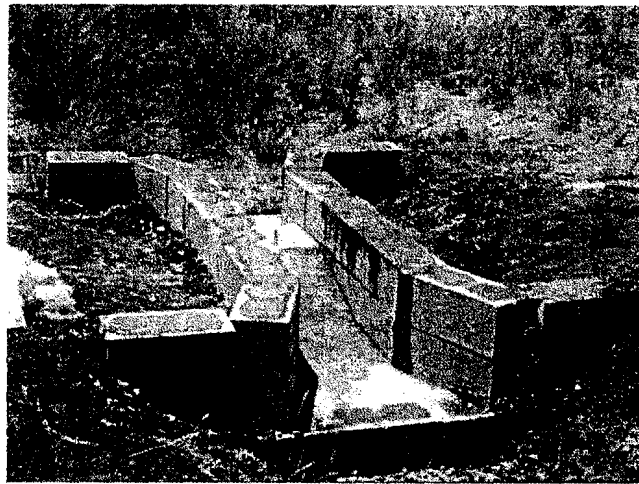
Long-throated flume with a rectangular throat section, constructed from concrete block
